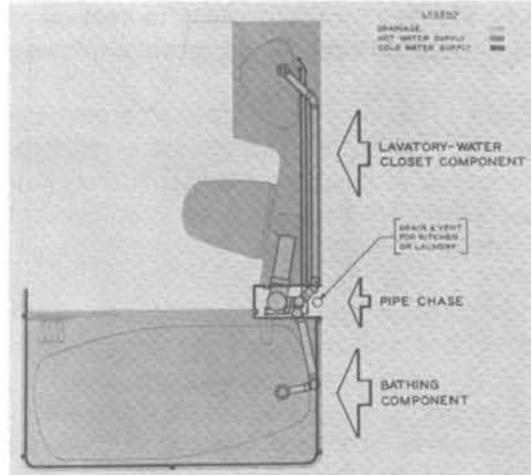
Preassembled supply and drainage installed within cabinet structure.
